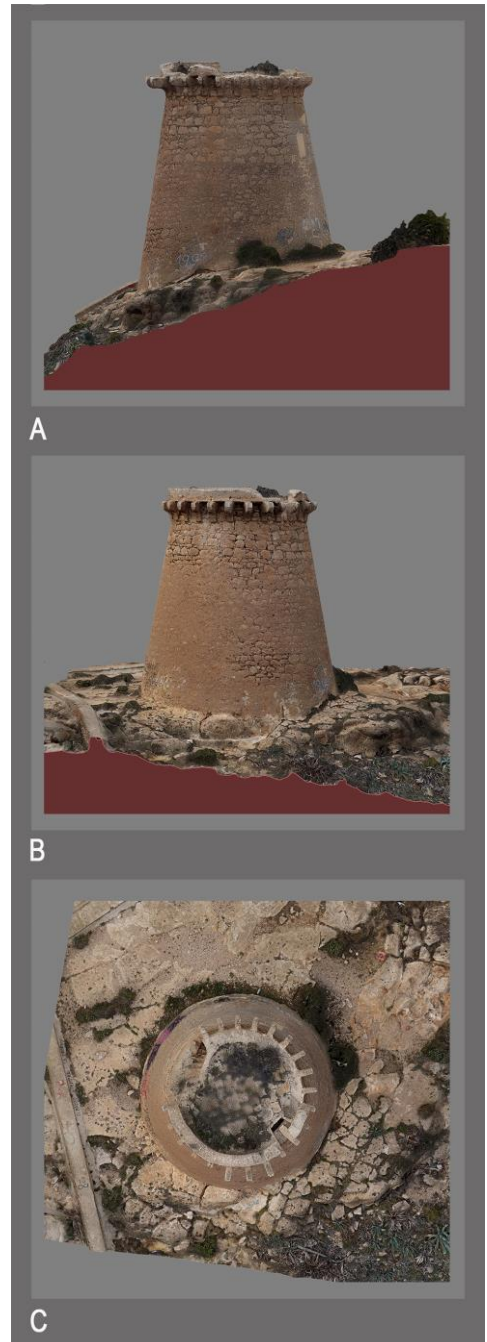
Photogrammetric elevation by SfM of the Escaletes Tower (Santa Pola, Alicante). A- East elevation. B- South elevation. C- Plant. (Graphic elaboration: P. Rodríguez-Navarro).
